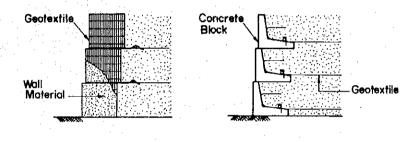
Conceptional Sketch of Reinforced Earth Wall
